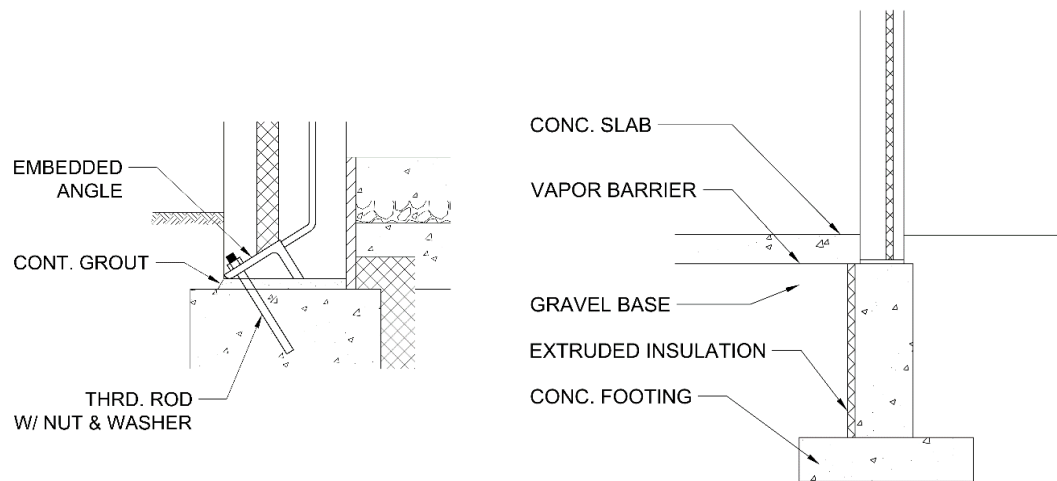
Sample foundation details where insulation is also placed around foundation
